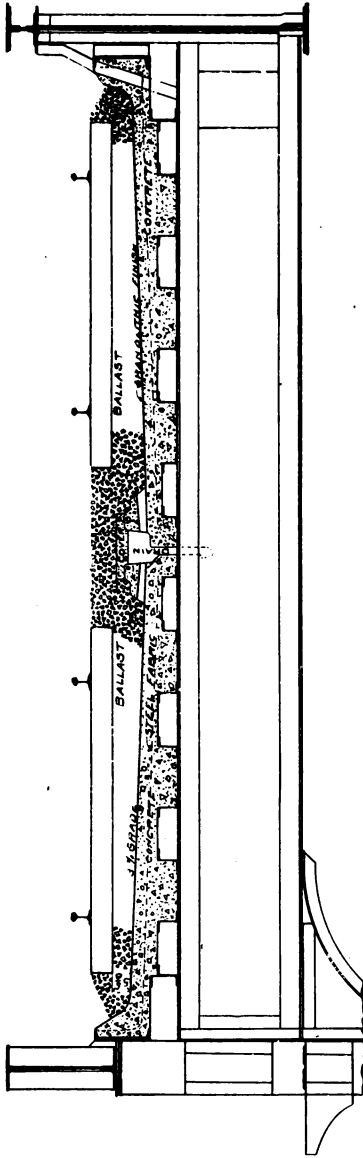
Type of Elevated Roadbed Construction used by the Philadelphia Rapid Transit Co. on its Elevated Line. Longitudinal steel troughs covered with concrete. Stone ballast under ties. It is believed this type of construction is the most effective in the reduction of noise of any that has ever been employed on an elevated road.
